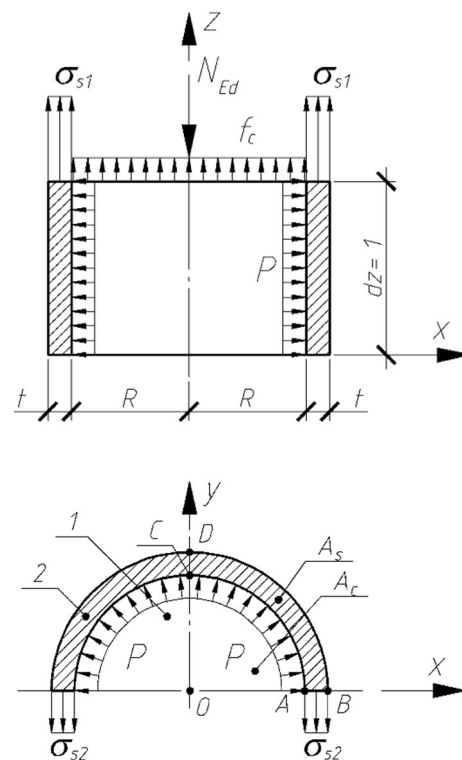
Design diagram of concrete-filled steel tubular member deformation mode:
